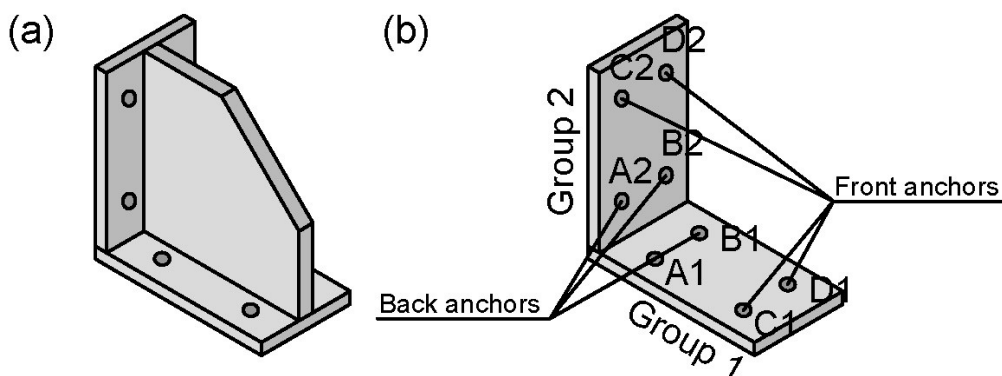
Schematic depiction of (a) the bracket-to-gusset plate connection (spatial group of eight anchors) and (b) segmentation of the spatial group with eight anchors into two groups with four anchors in each plane.
